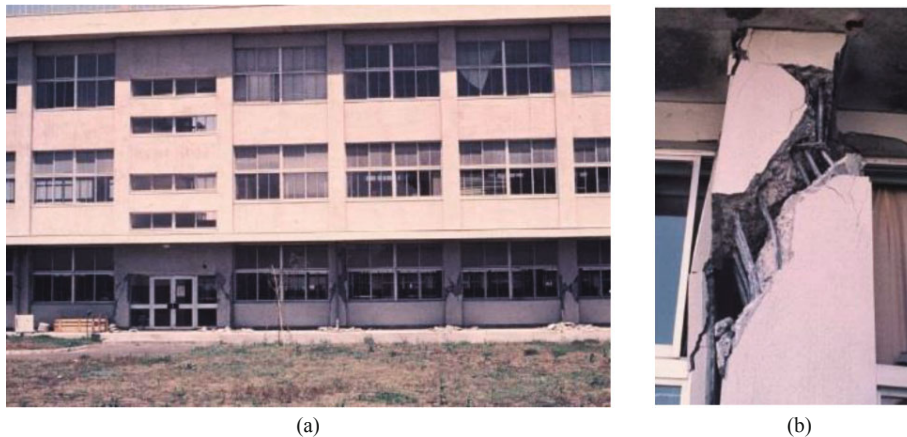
School building in Hachinohe, Japan damaged during 1968 Tokachi-oki earthquake (Aoyama, 2010)
